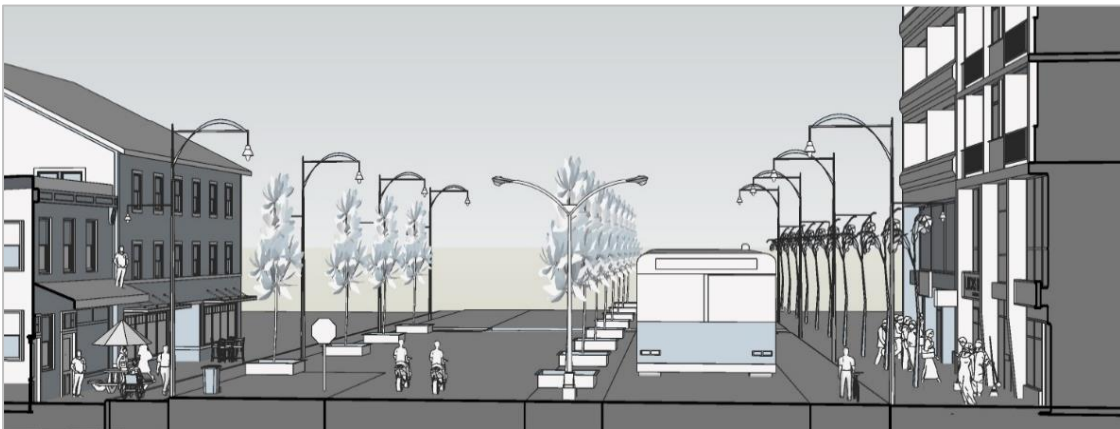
Cross-Sectional View of Lady Grey Street between Waterkant Street and Berg River Boulevard
